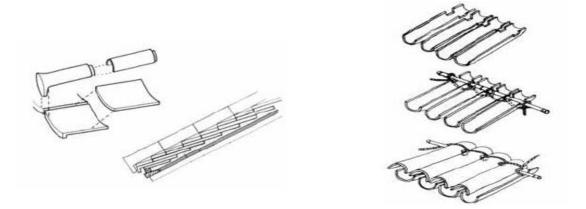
Concave and convex tile (L) and bamboo roofing (R) (Source: Piccinini, 2000)
